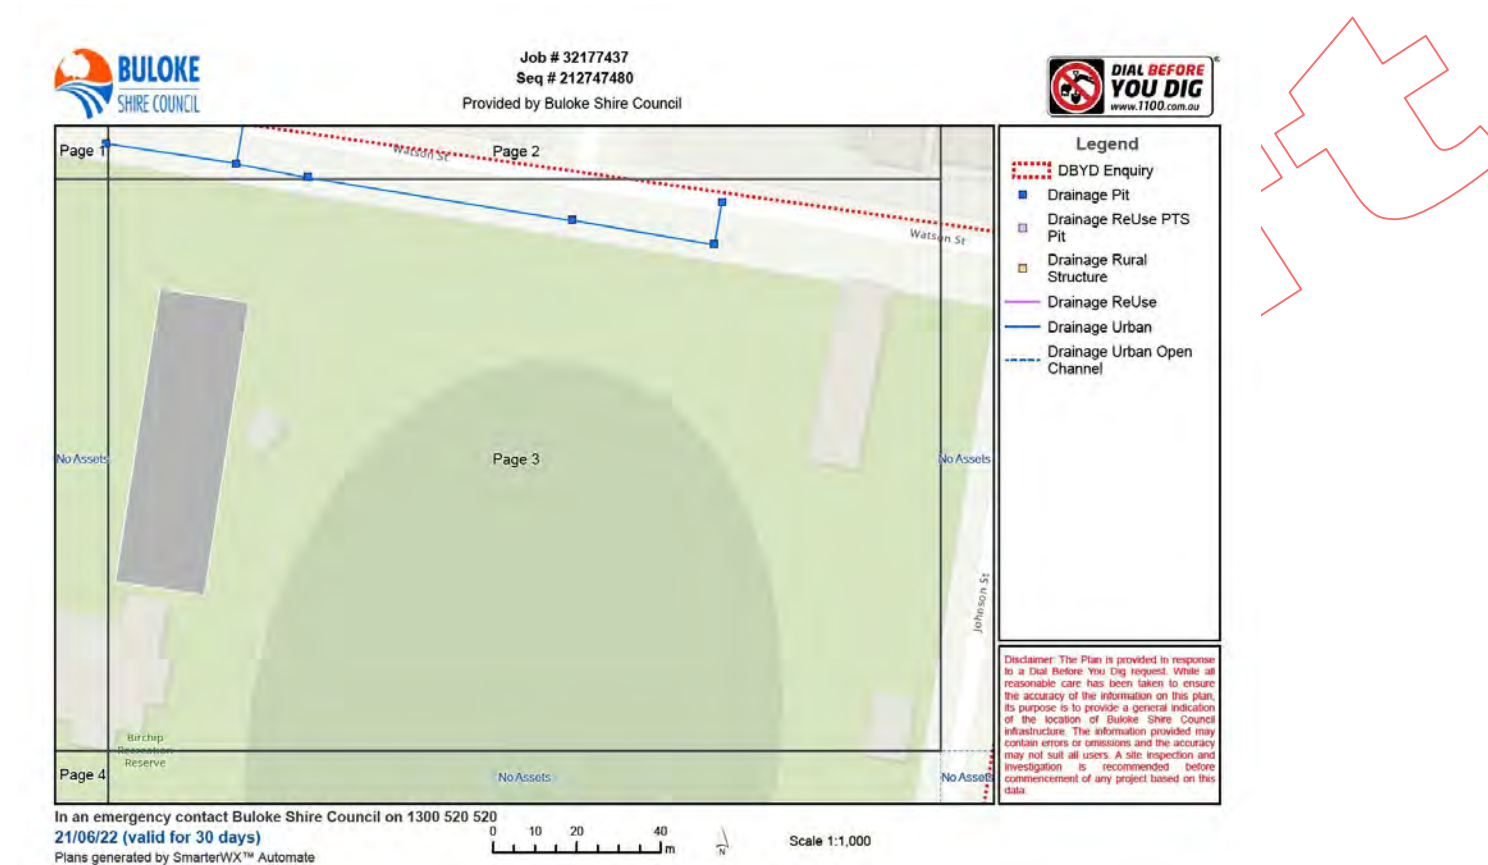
Drainage and pit location, Watson St Birchip, north of Reserve
